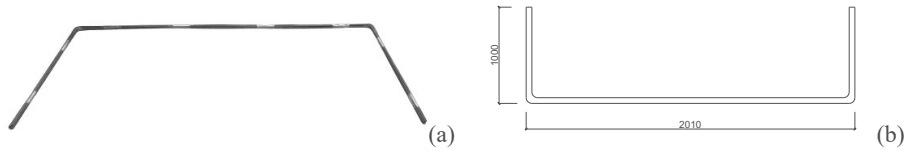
(a) U-shaped titanium threaded rods, (b) dimensions.
